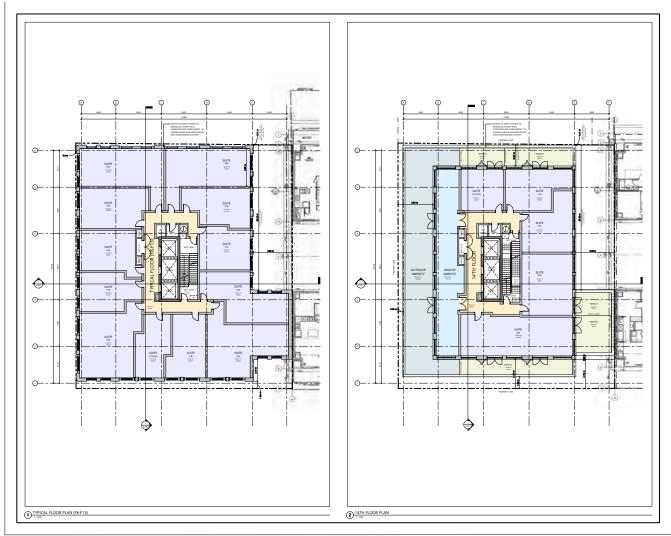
Typical Base Building and 14th Floor Plans (AUDAX)
